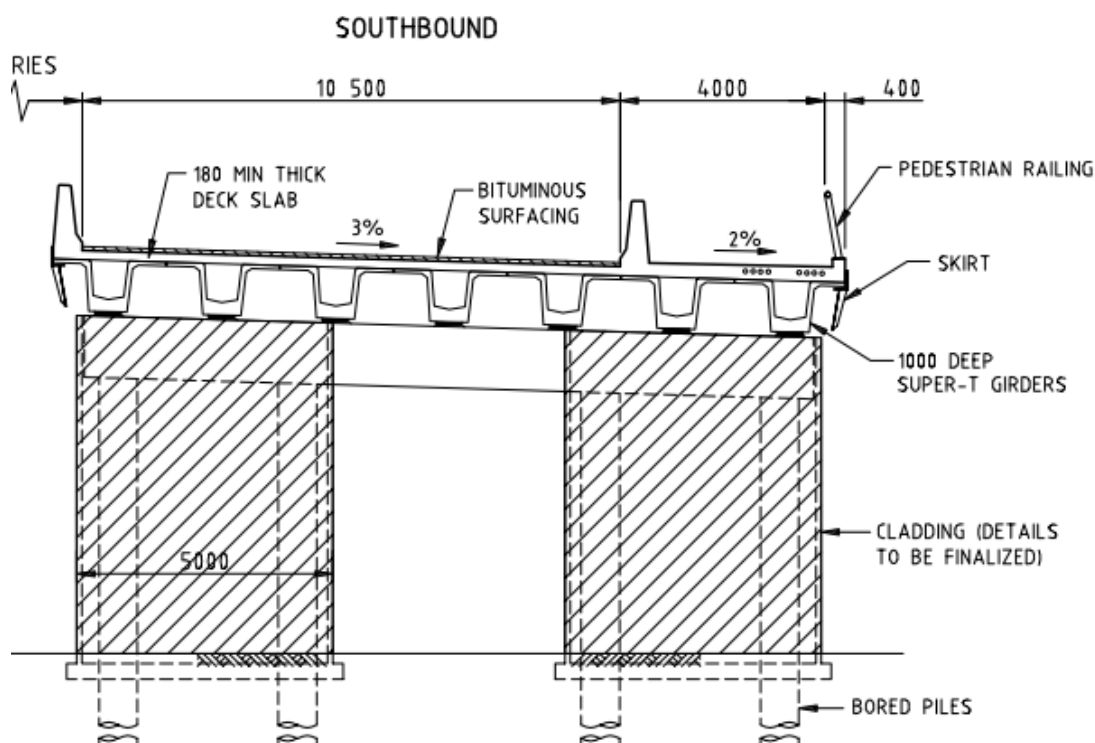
Typical Cross-Section at Pier – Super-T Bridges
